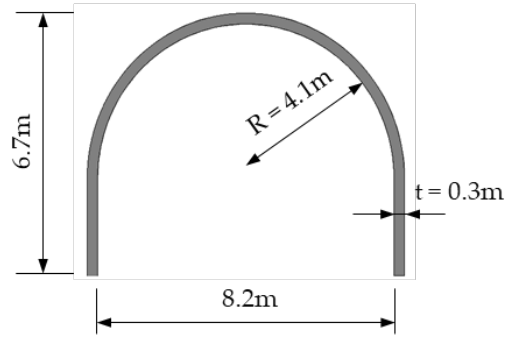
Cross-section of the prototype tunnel (adapted from [52])
